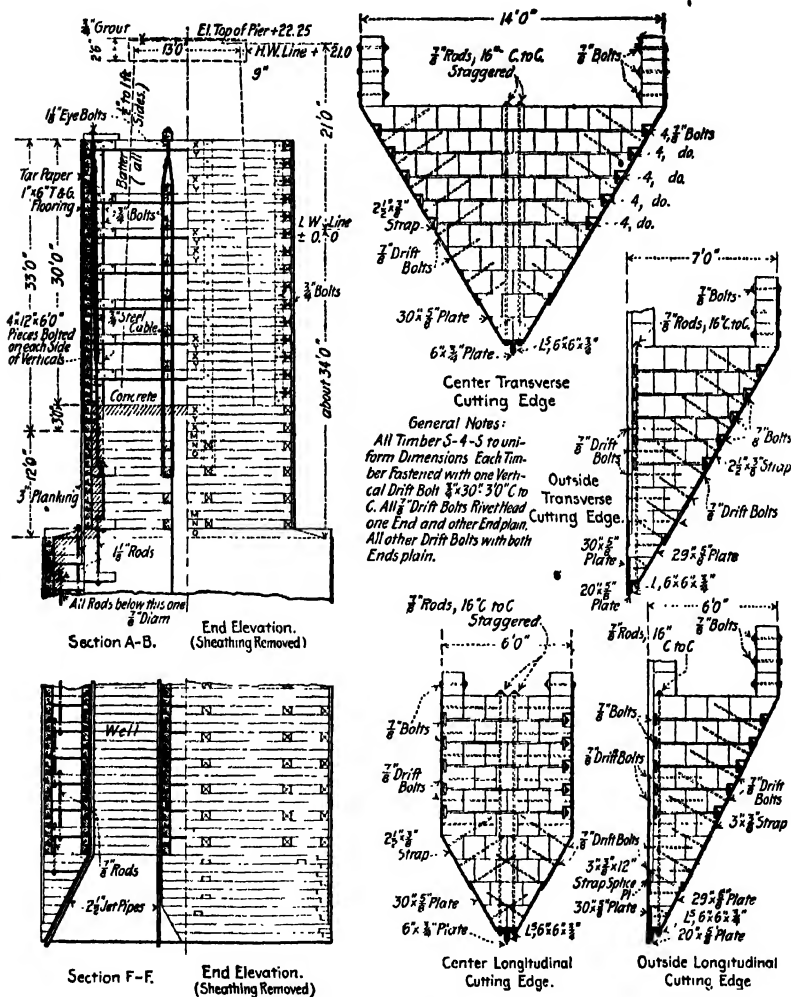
C.—Open Caisson with Dredging Wells and Superimposed Cofferdam.
